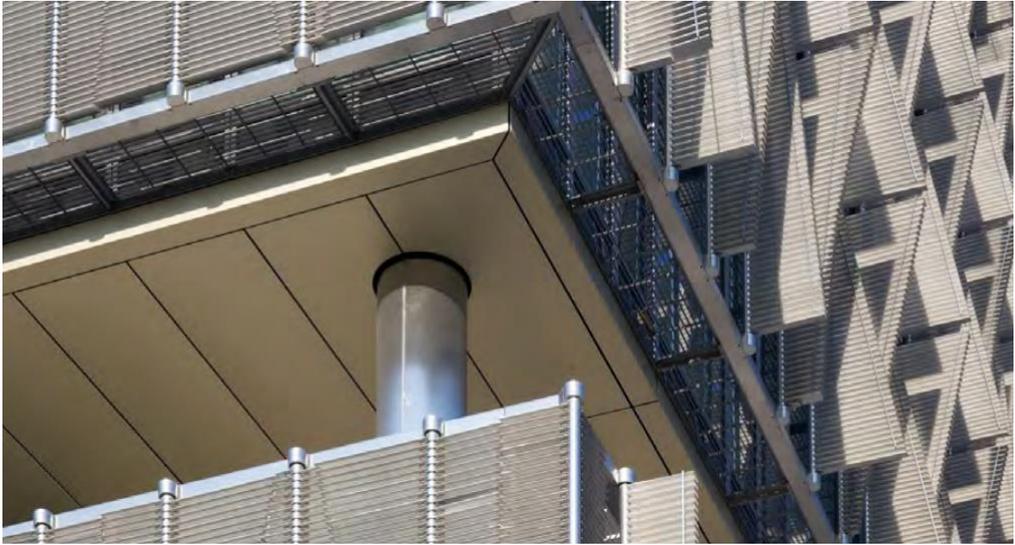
Adaptive shading system of Q1 Building, ThyssenKrupp Quarter (Balascakova, 2016)
